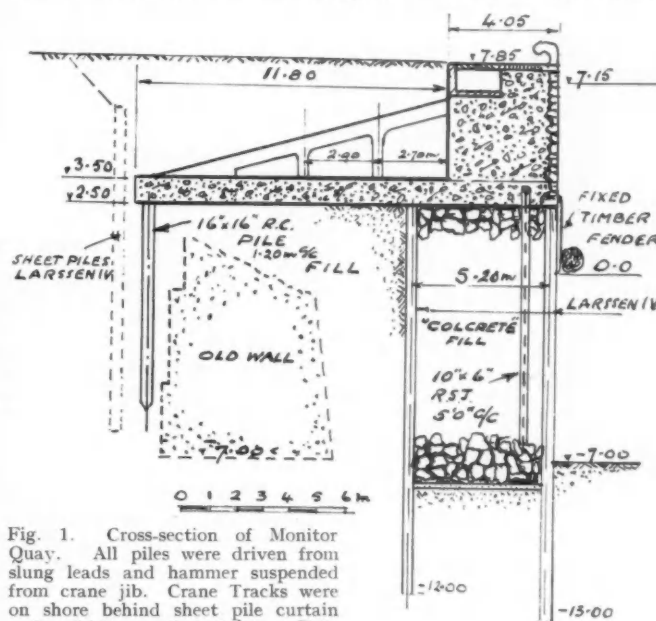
Cross-section of Monitor Quay. All piles were driven from slung leads and hammer suspended from crane jib. Crane Tracks were on shore behind sheet pile curtain wall, which was first driven. R.C. piles supporting quay deck were driven after backfill was placed.
